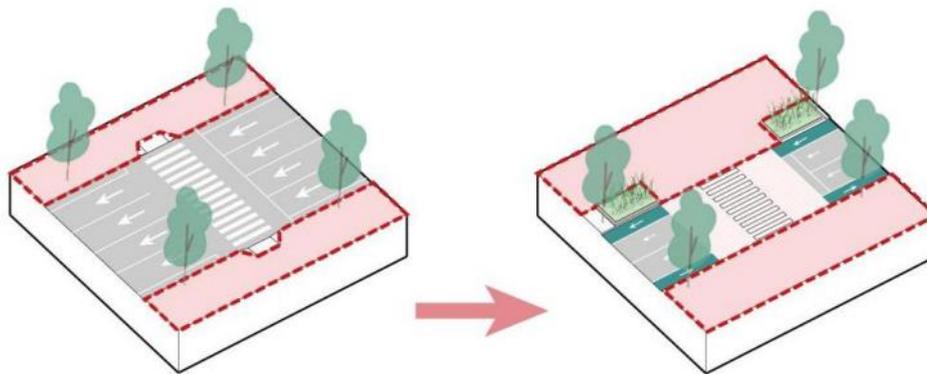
Compressed lane width on Tianhe Nanyi Road to release street space (Source: Completed by author)
